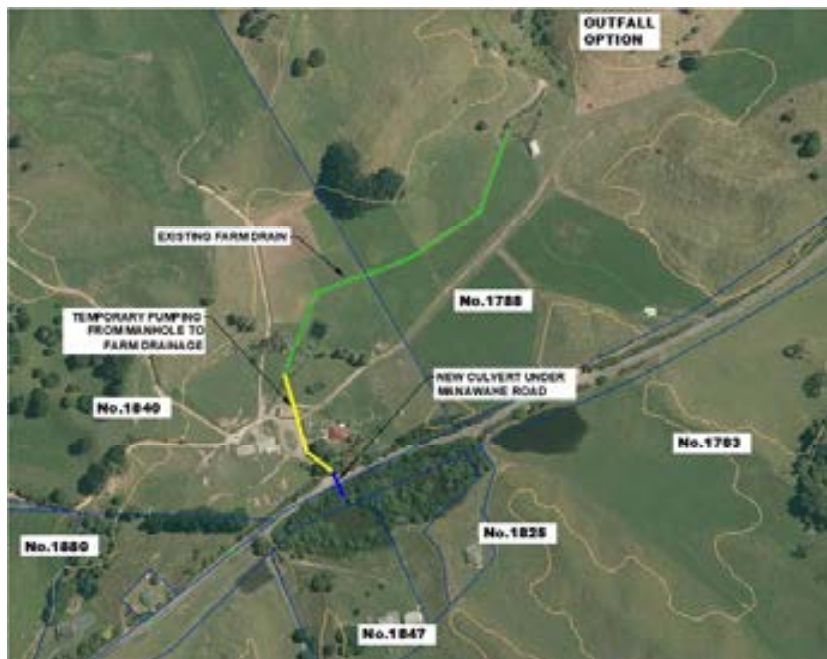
Plan showing arrangement of Option 1 temporary pumping
